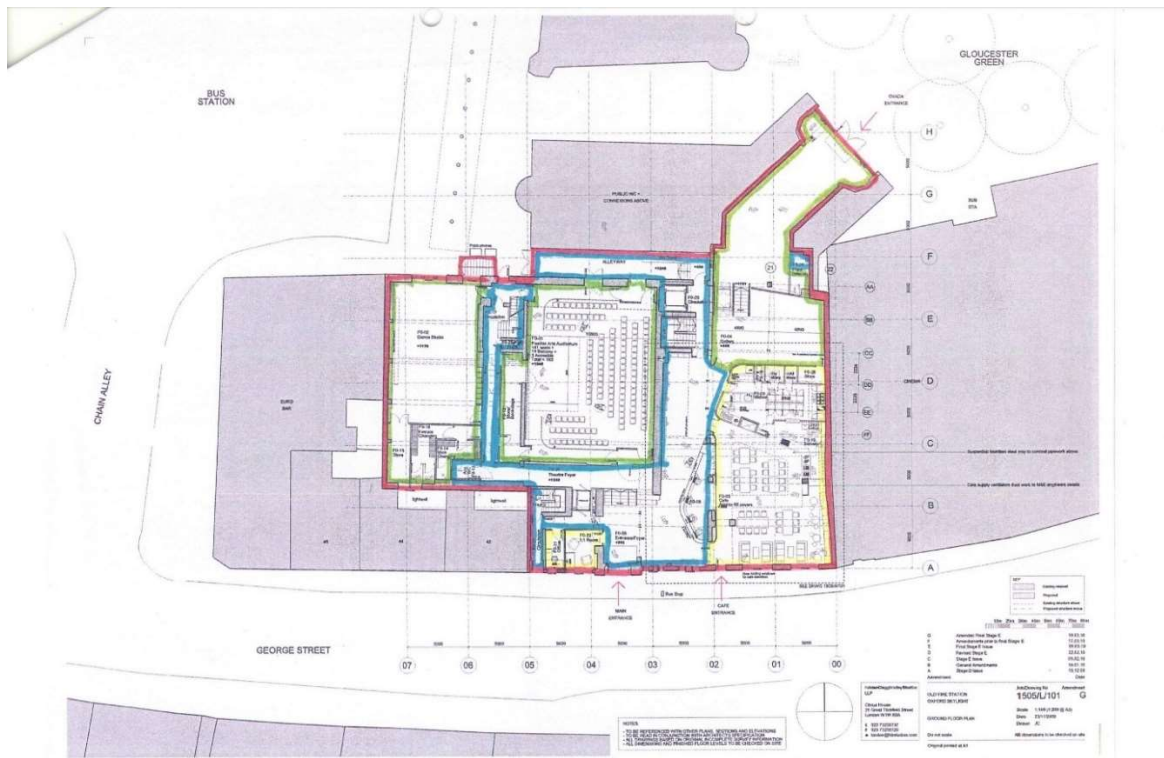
Old Fire Station ground floor planning document, FCB Studios, 2009.
